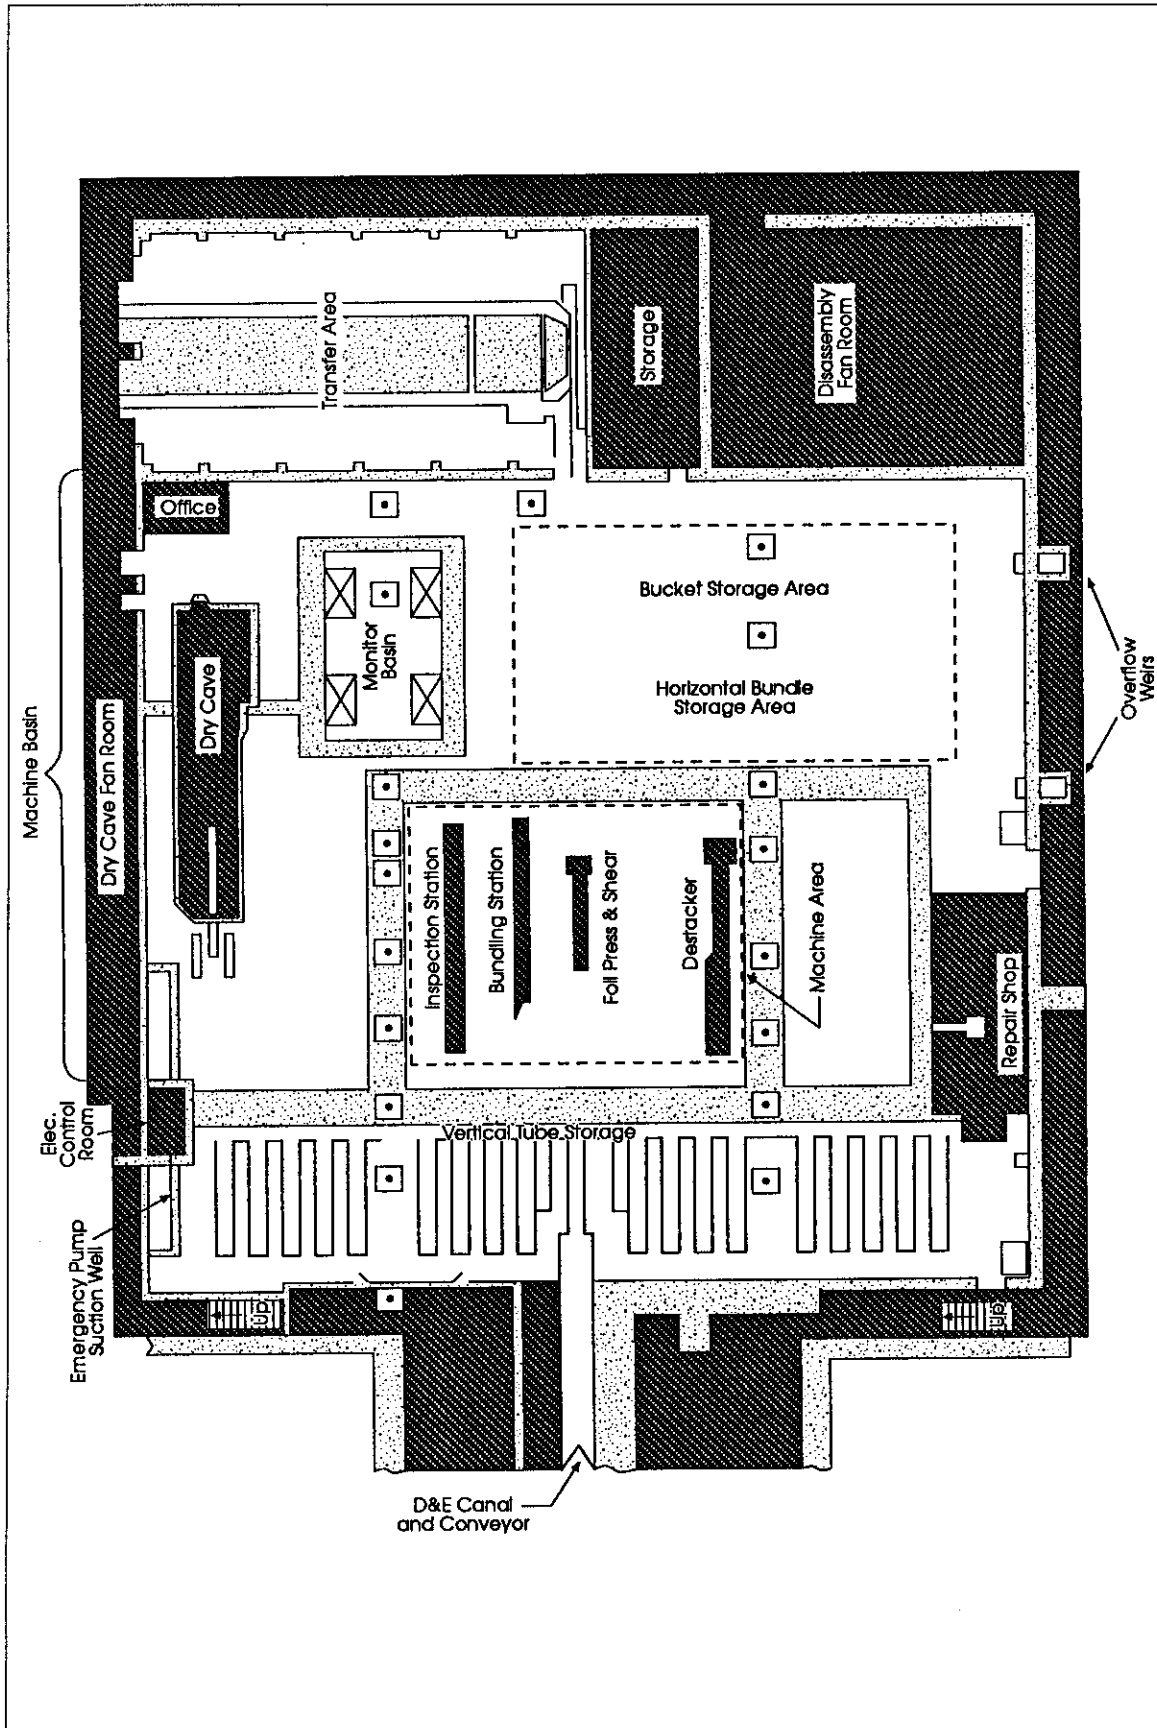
Typical Reactor Disassembly Basin Area Layout
